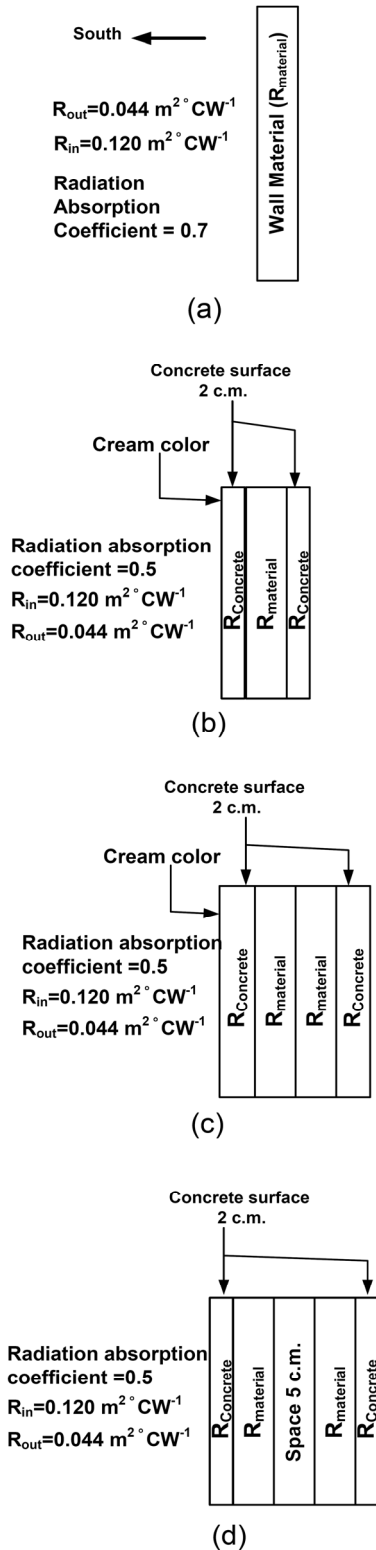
Wall models; (a) Single material wall model, (b) Painted concrete plastered walls model; common construction method, (c) Double wall model and (d) Double wall with gap model
